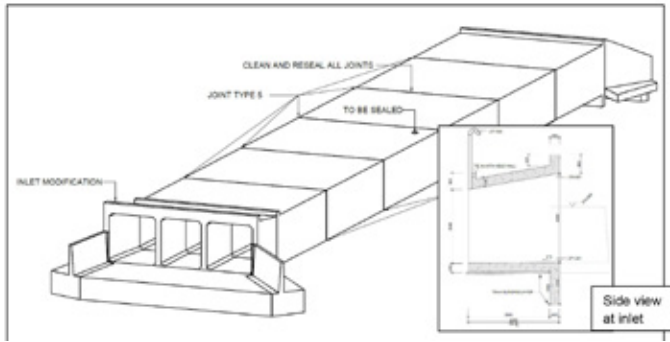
Modified inlet design (Umbilo River culvert system)
